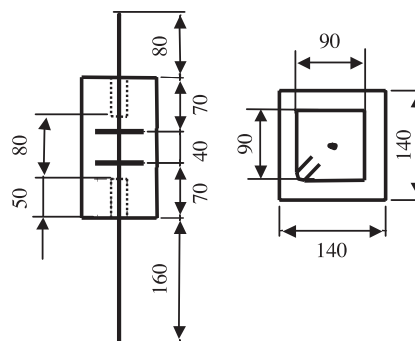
Geometry of the specimens used in the study. All dimensions in mm.
